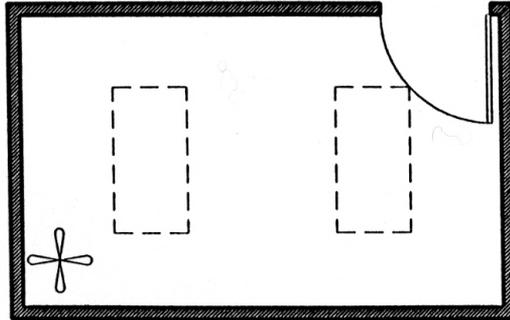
Plan of Skilled Care Work Area - Site 3.
